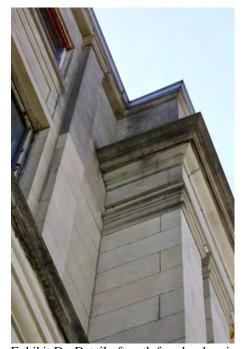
Exhibit D - Detail of north façade, showing darker stone on fourth floor
